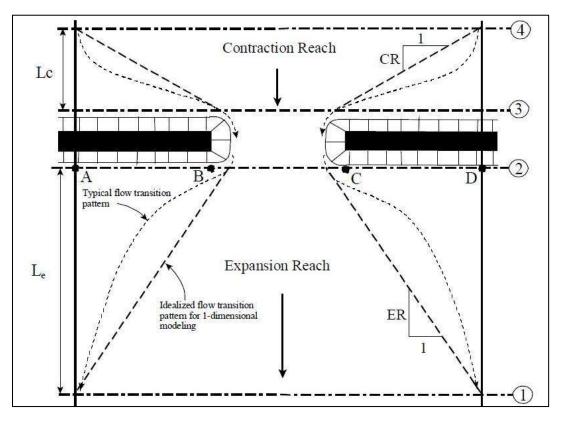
Cross Section Locations for Hydraulic Crossings
